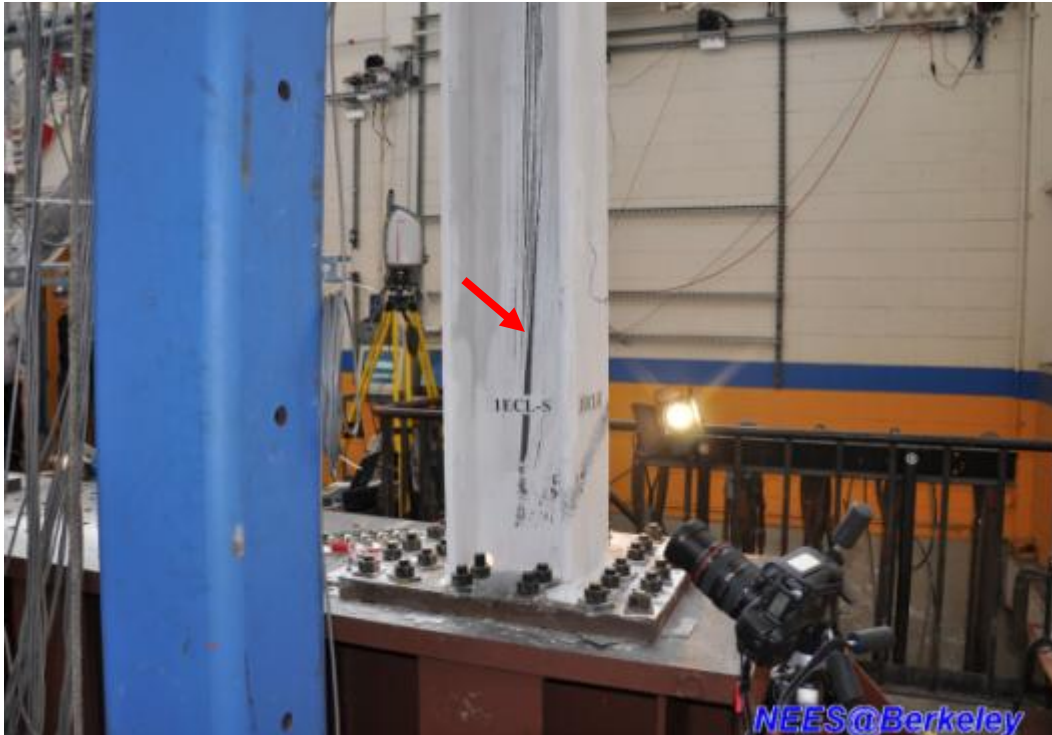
Specimen TCBF-B-2: column web yielding at the east-side column at ground floor.
